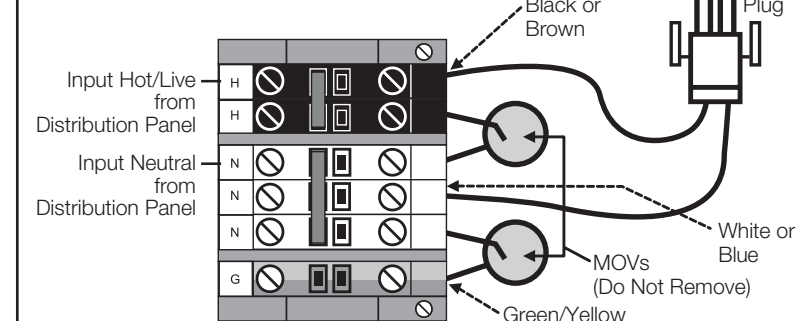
Dedicated Control Assembly Feed for HWI-PNL-8
